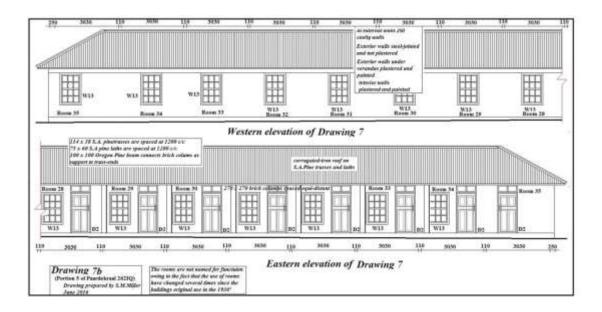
Above. Western and Eastern elevations of the building captured in Drawing 7. (Drawing S.M. Miller 2016.)
